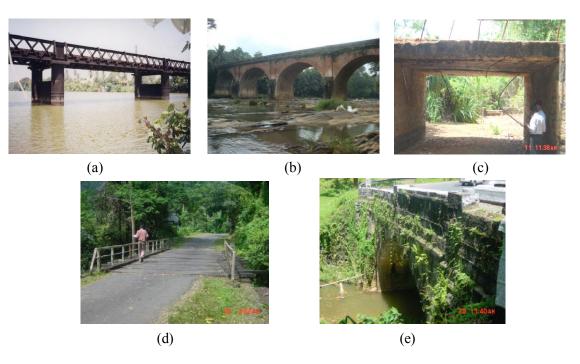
Views of (a) Kelani railway bridge; (b) Mawanella bridge; (c) Elahera bridge; (d) Yatiyantota bridge; (d) Hatton bridge
